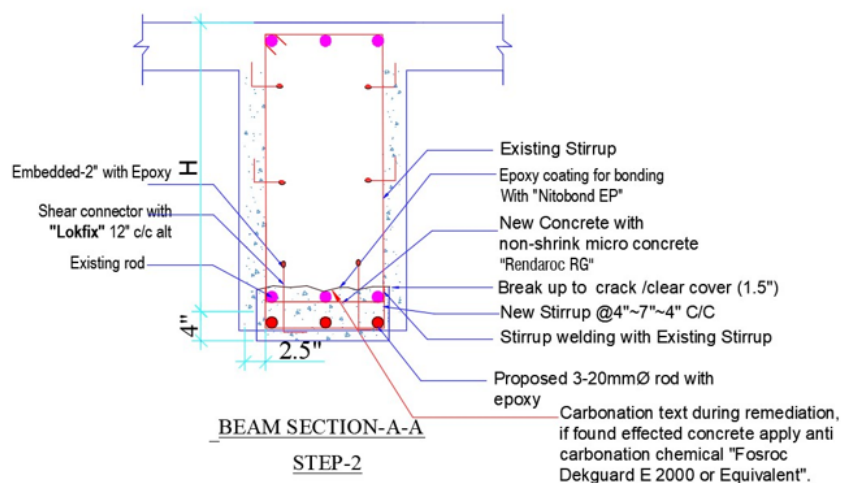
Beam Section A–A repair detail for cracks exceeding the main reinforcement: existing stirrups, epoxy-coated bonding interface, new non-shrink micro-concrete, and welded supplementary stirrups.
